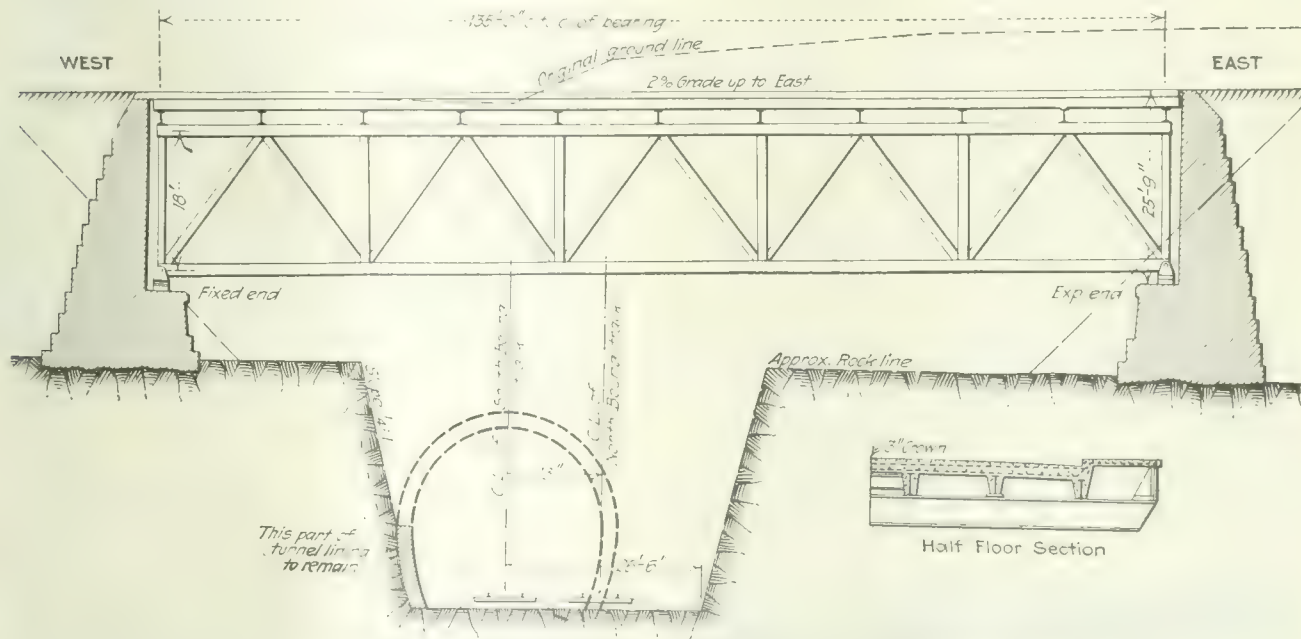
CROSS-SECTION OF OLD TUNNEL AND NEW CUT, WITH BRIDGE OVER CUT
